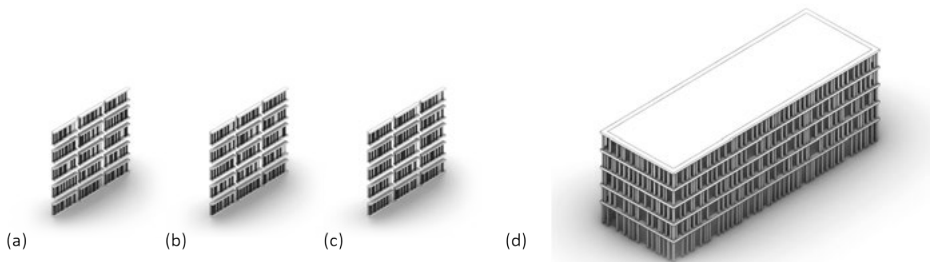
(a) South-facing facade elements 15/441. (b) East- and West-facing facade elements 15/474. (c) North-facing facade elements 15/75. (d) Final design of column placement.
